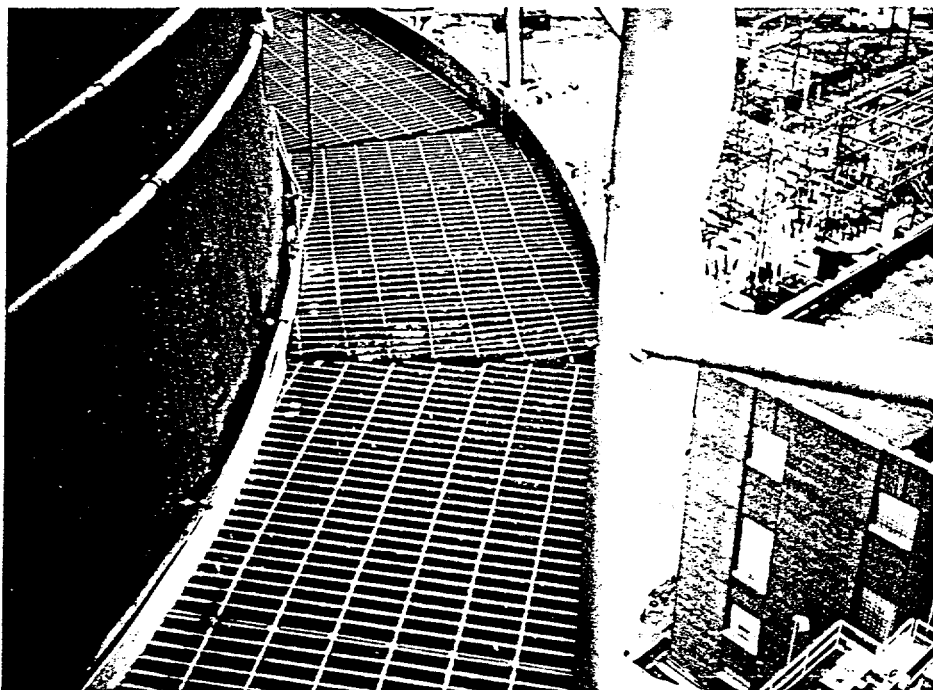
Typical condition of monitoring platform. Note damaged grating.
